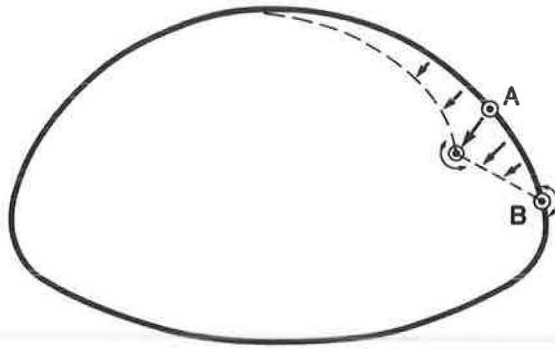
Schematic representation of observed failure mode of 28-ft span pipe-arch culvert near Cooper City, Florida.
